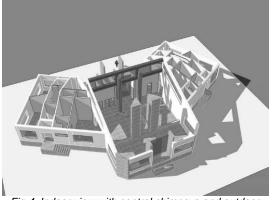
Indoor view with central chimneys and outdoor insulated walls
